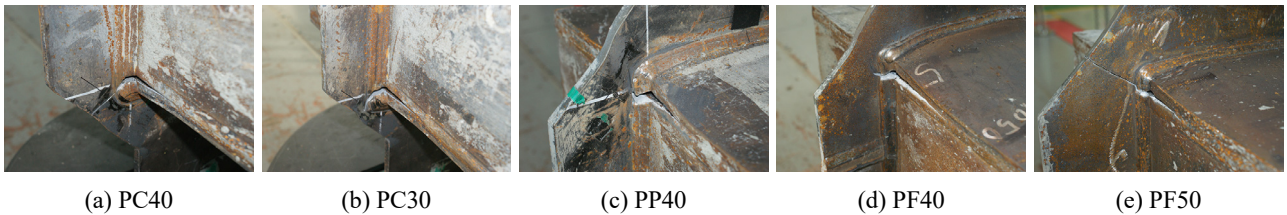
Crack of column and diaphragm (column PJP specimens)
